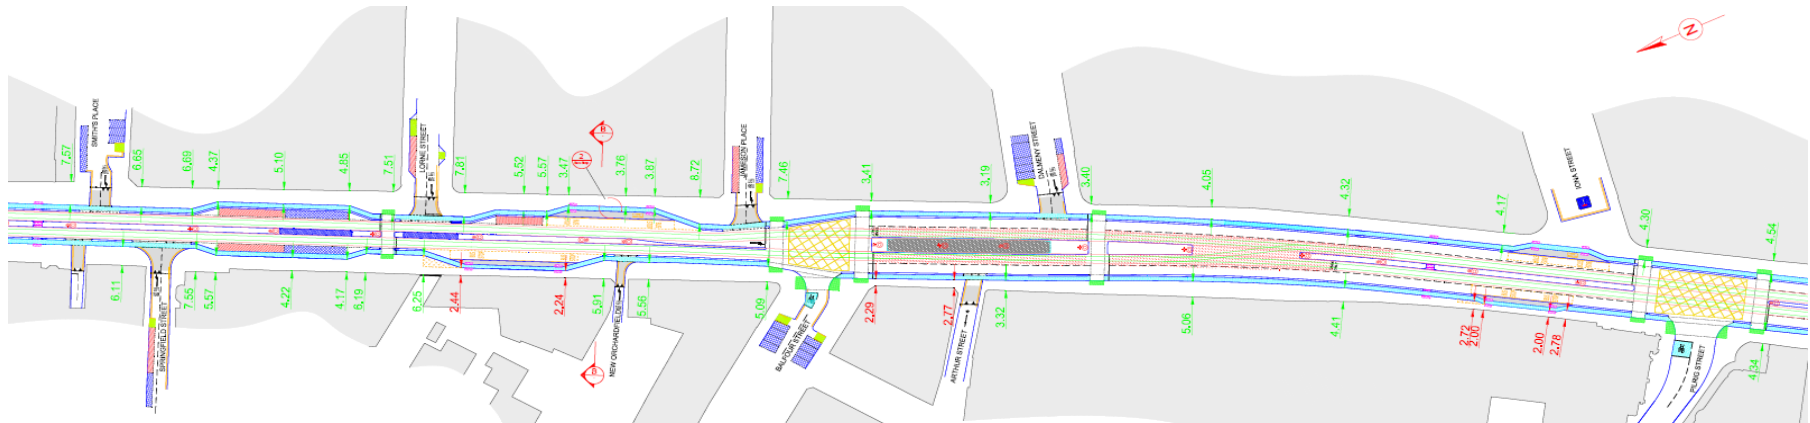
Leith Walk- Option 3b Smiths Place to Pilrig Street
